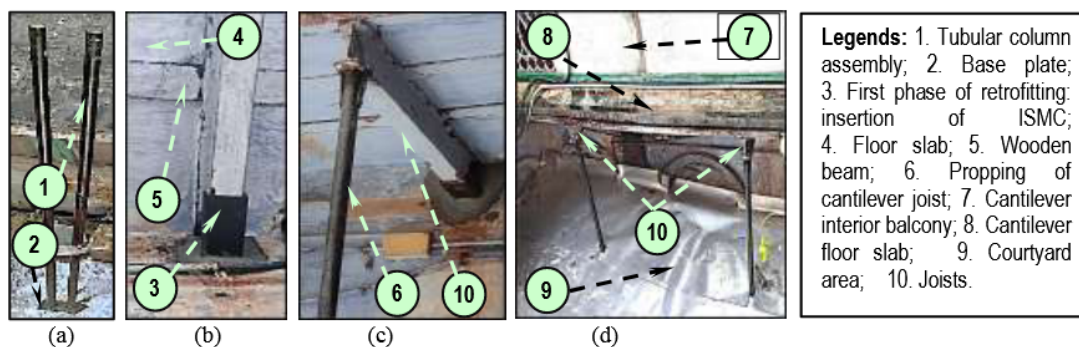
Photographic views of: (a) Tubular column assembly, (b) Retrofitting first phase, (c) Joist propping, and (d) retrofitted joists
